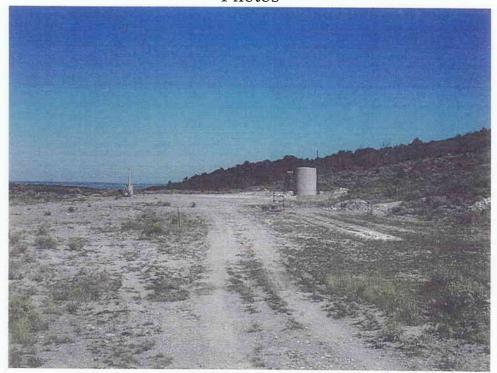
View of Site from Road 9-27-01 (from Location A on Schematic)
